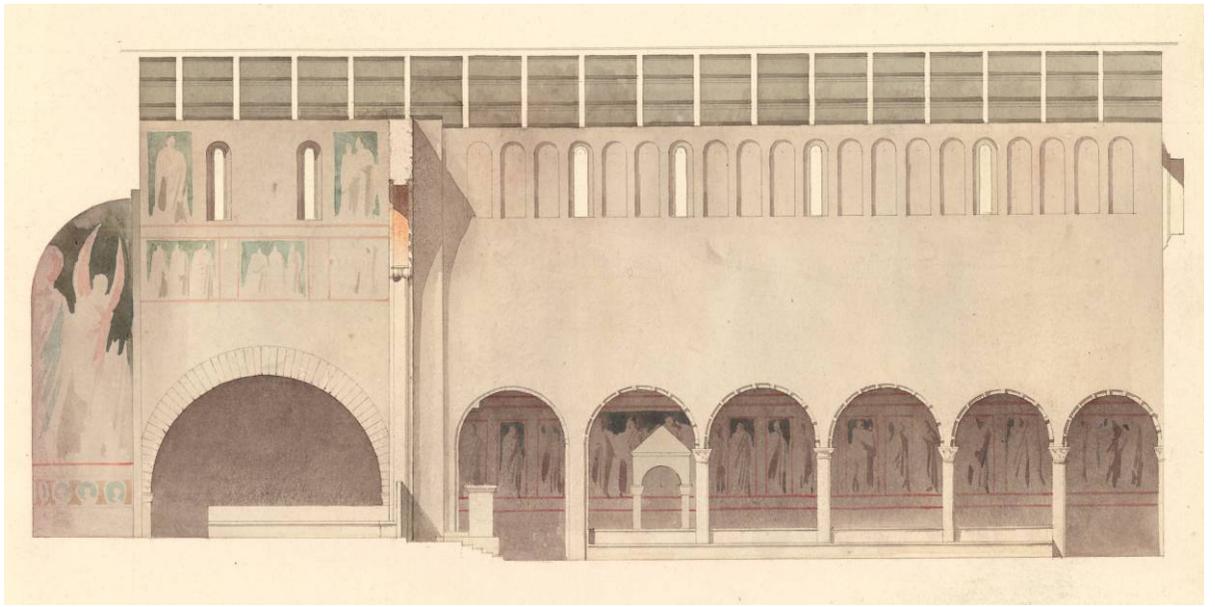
Longitudinal section of San Pietro in Tuscania (detail of fig. 1).
